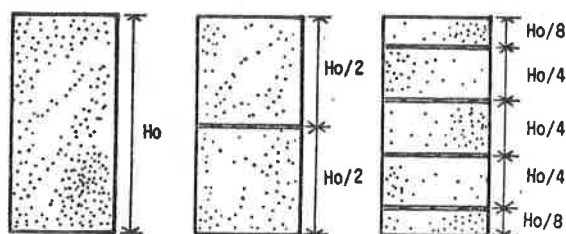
Positions of Geotextile Reinforcement upon Application of the Confining Pressures
